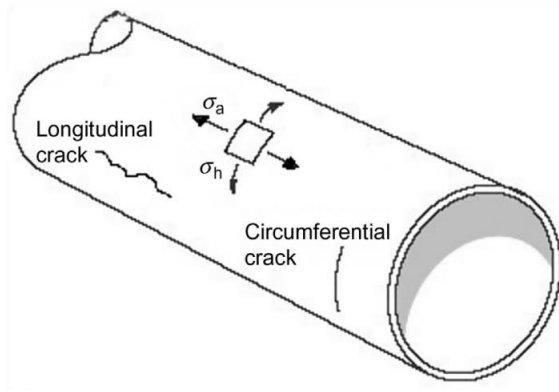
Stress and cracks on the pipe wall (Mahmoodian, 2018)
